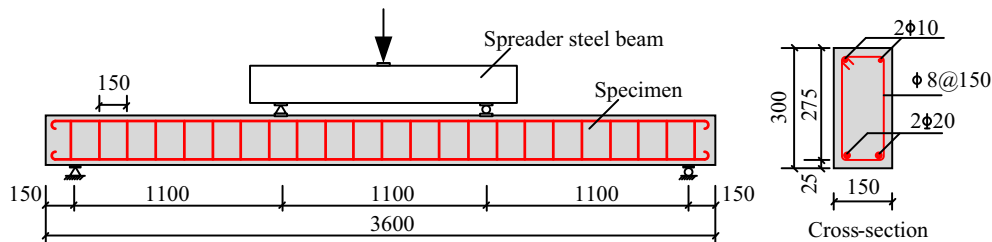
Dimensions of test specimen (all dimensions are in mm).
